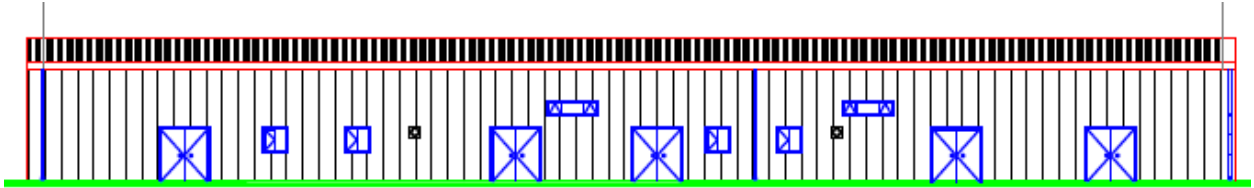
Warehousing platoon administration building elevation (Courtesy of USACE)
